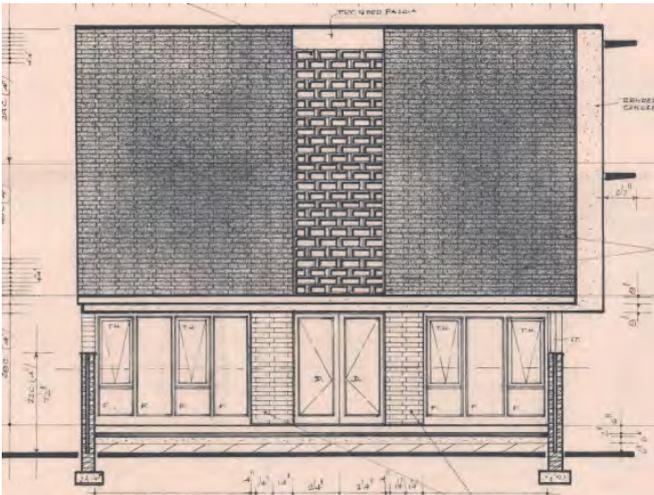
& 8 - East and north elevations, from drawings related to permit no. 57/2336 (M Feldhagen, 1961/62) (Source: Council Building File)
